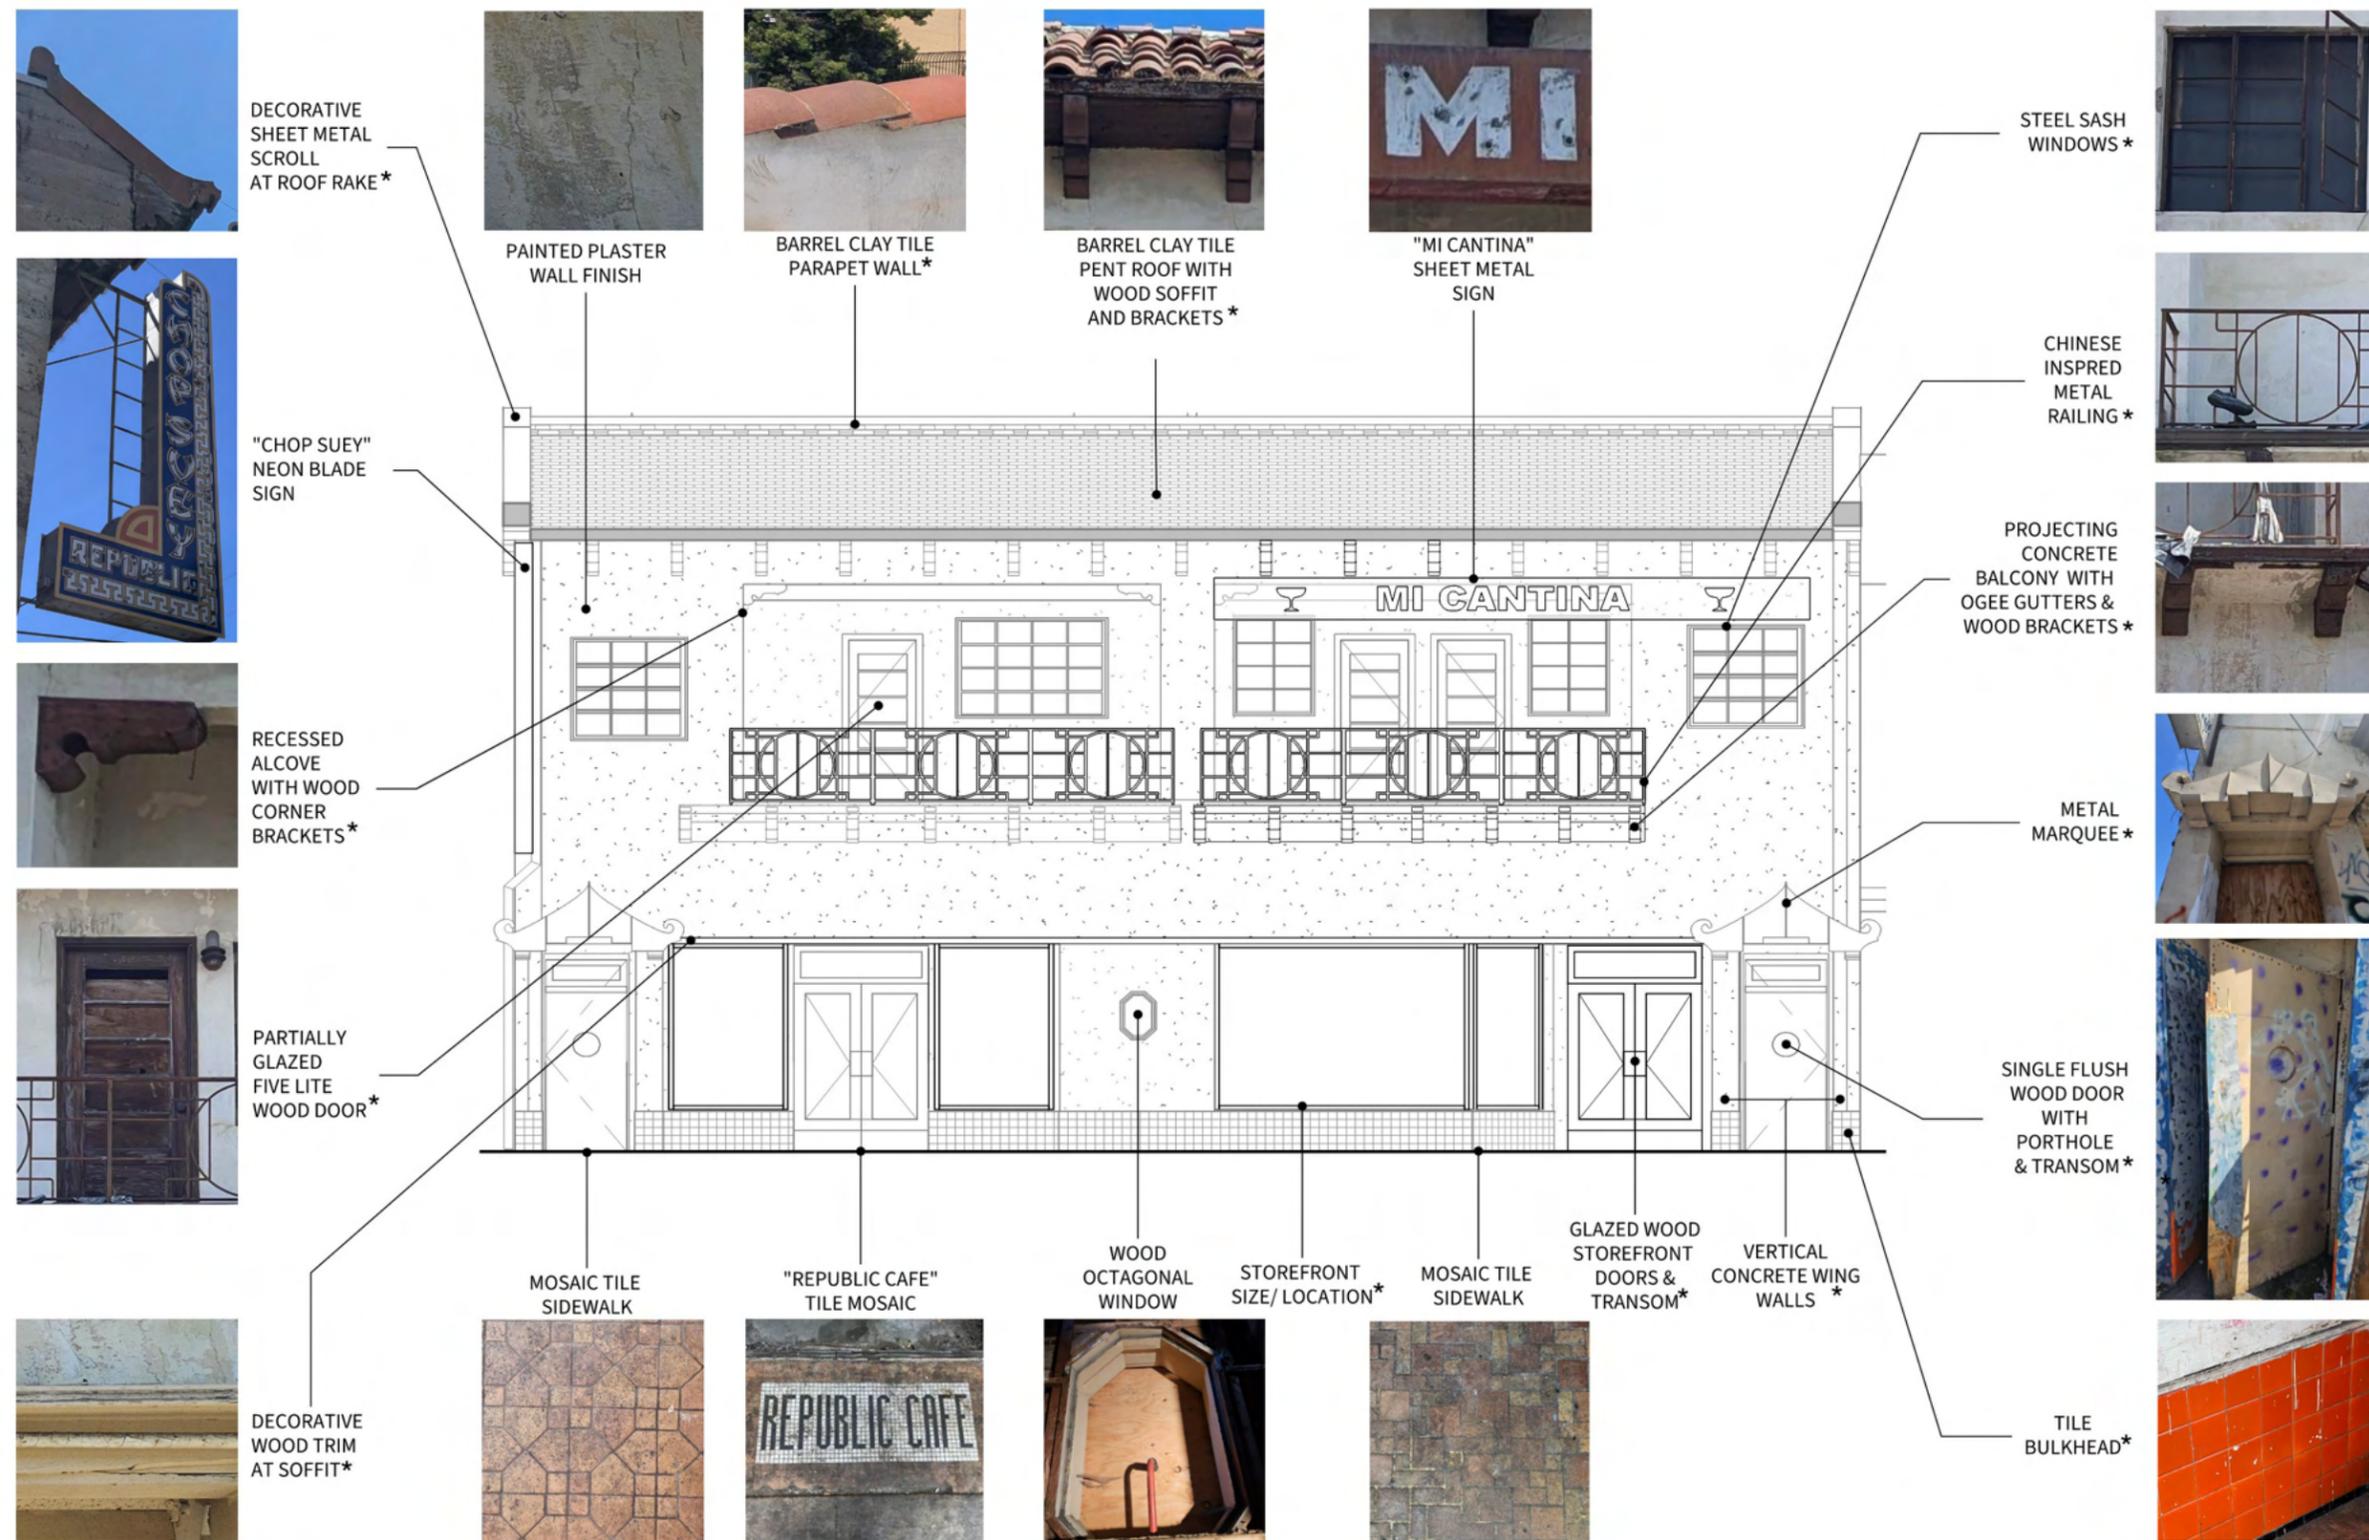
37 and 39 Soledad Street West Facade Character Defining Features, TEF, 2026.
